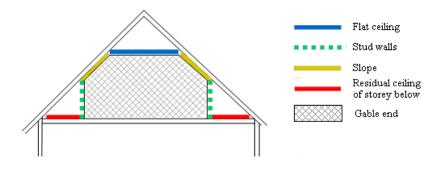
Different parts of roof rooms (instead of stud wall and residual ceiling there can be a common wall)
